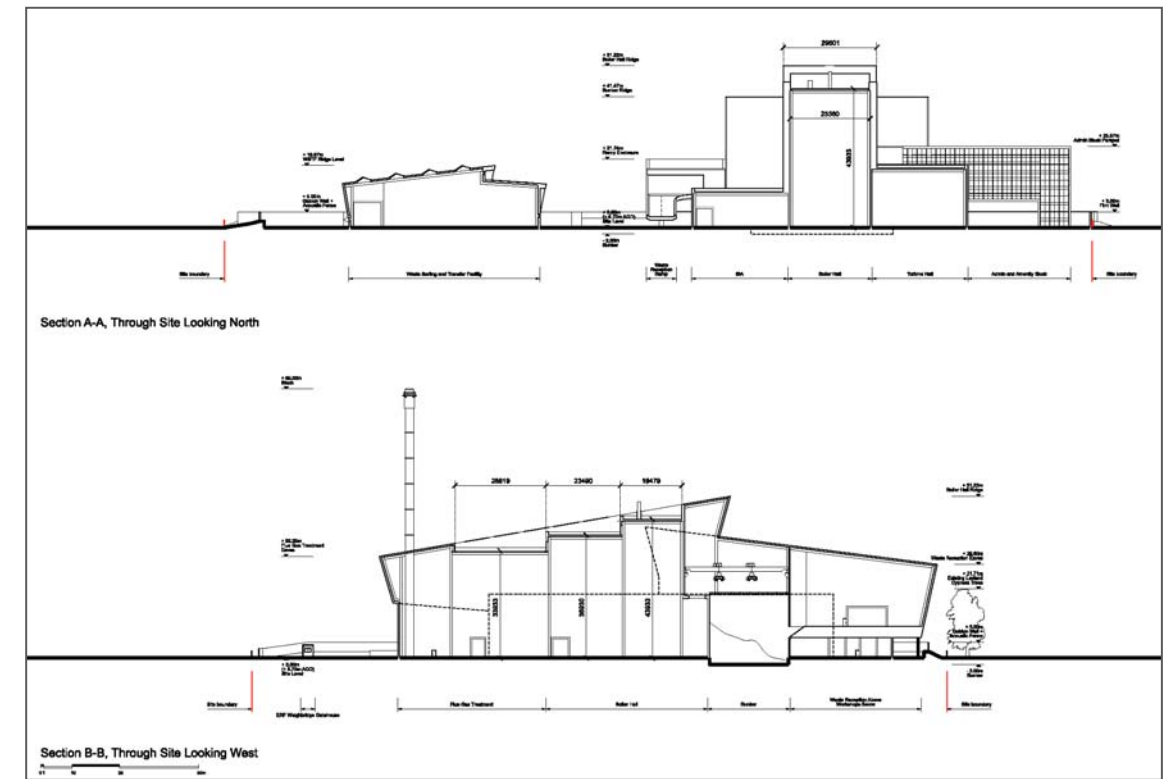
Proposed Site Sections – extract from drawing PL201
